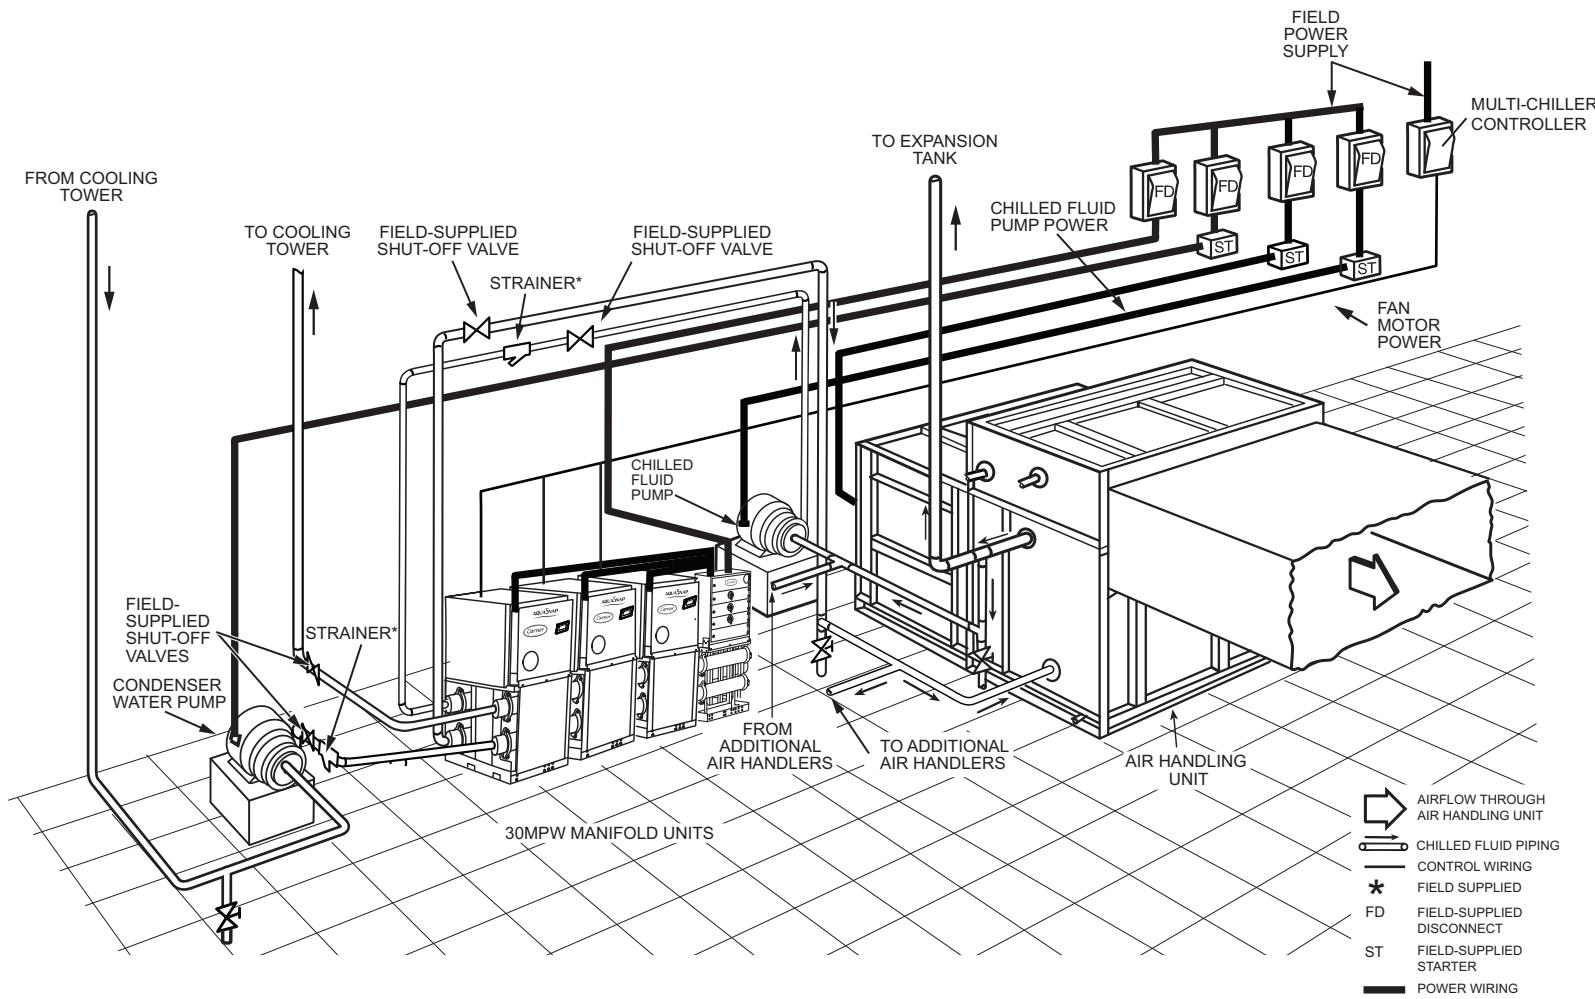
30MPW Typical Piping and Wiring Connections
